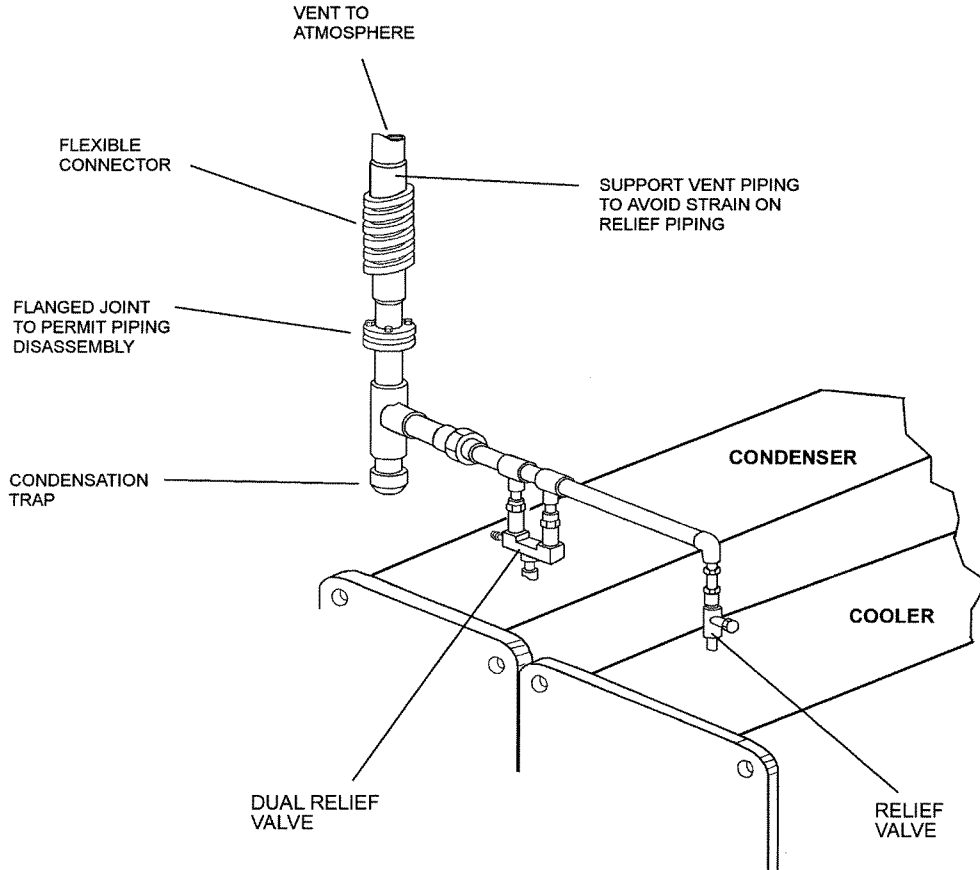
TYPICAL REFRIGERANT VENT PIPING FROM RELIEF VALVES
